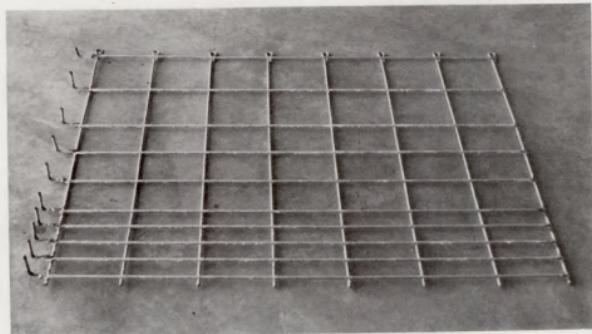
Panel type 1 (32 inches x about 4 feet).
